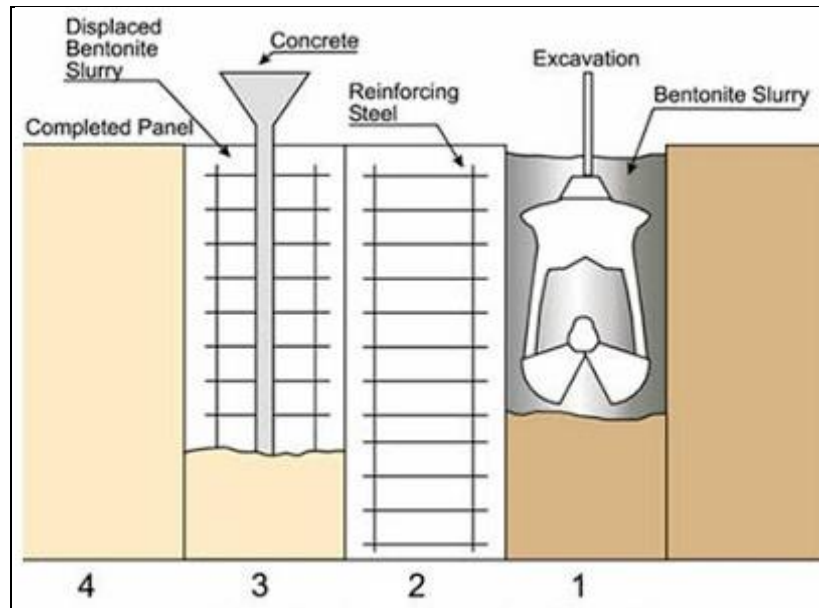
Diaphragm wall construction sequences in alternating panels (3-6 meters) [15]
